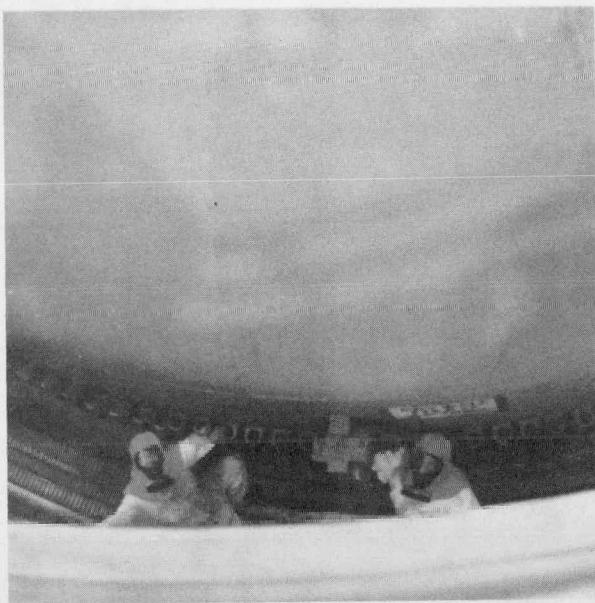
Drywell Head Bolts Loose (Hatch)
